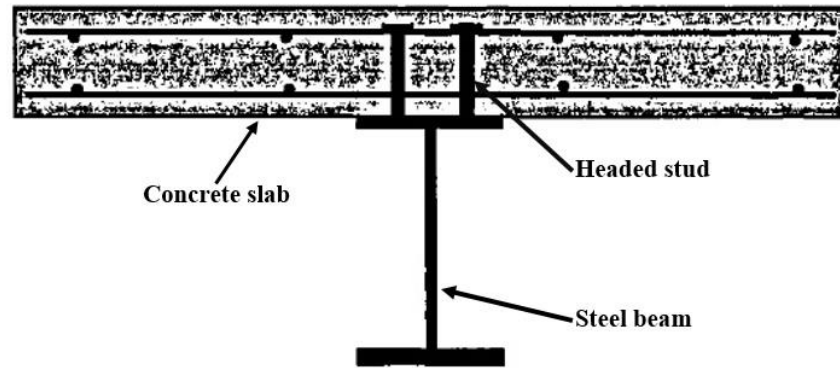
Composite beam with solid concrete slab (Wu 1998)
